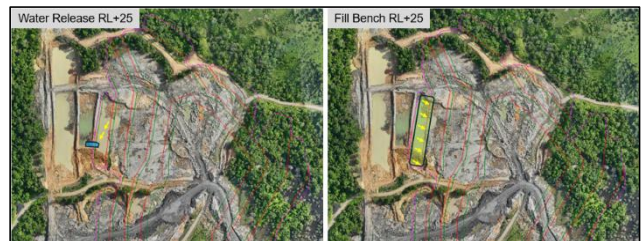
(a) Water Release Base elevation +25 (b) Fill Bench elevation +25
